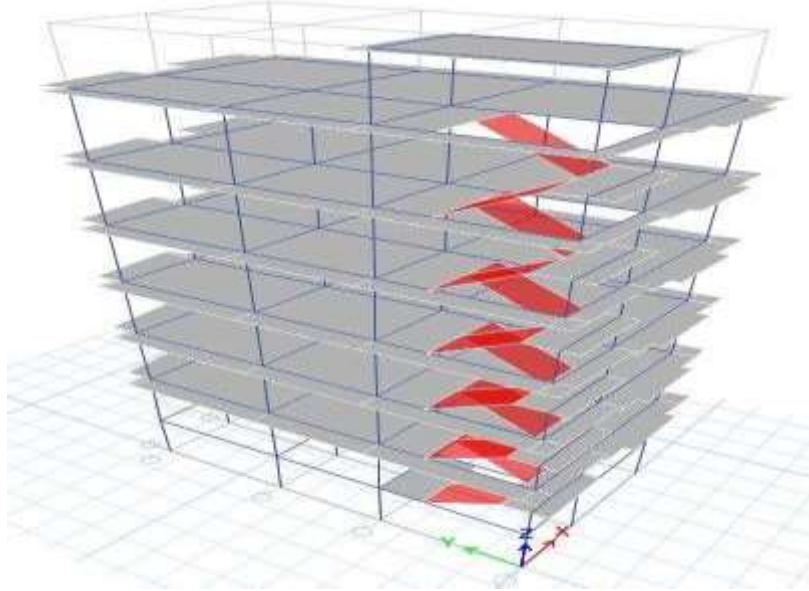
3D view of a 6 (six) storied RCC building in ETABS
